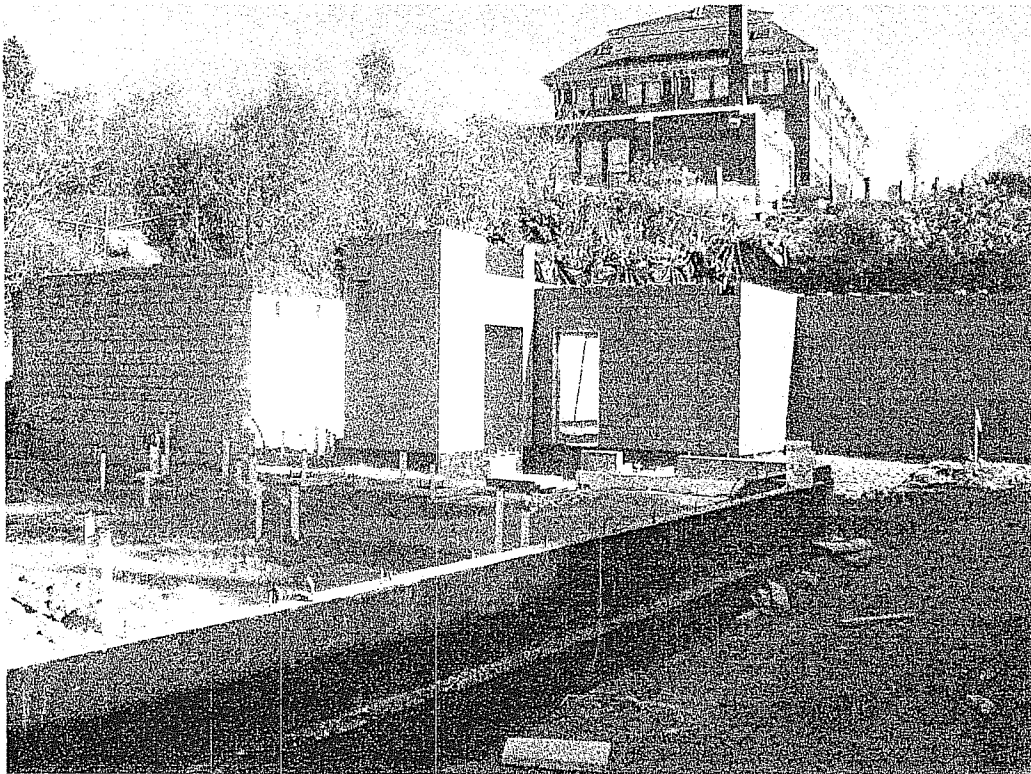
Six-inch wide stem wall with anchor bolts shown in foreground.
